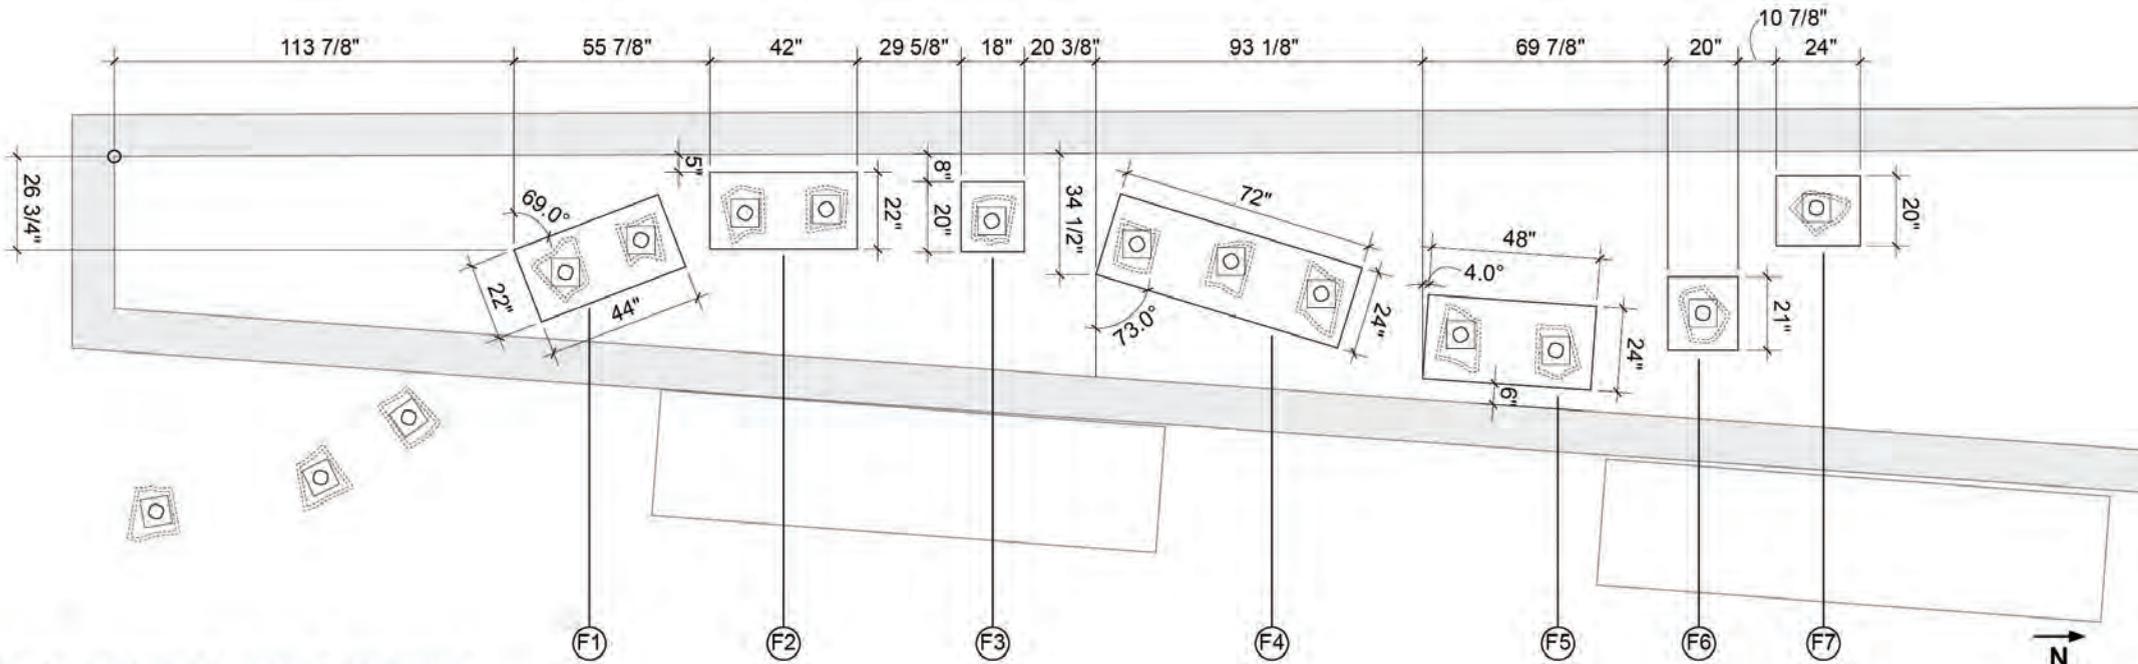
Coordinated drawings used for locating the concrete footings and steel posts.
